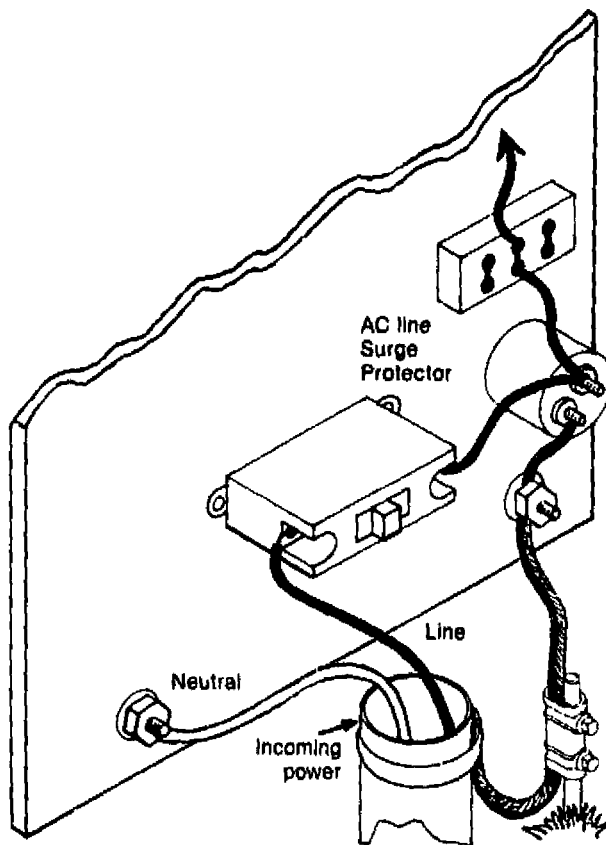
Installation of Line Surge Protector when AC Power Is Fed through Underground Conduit.
